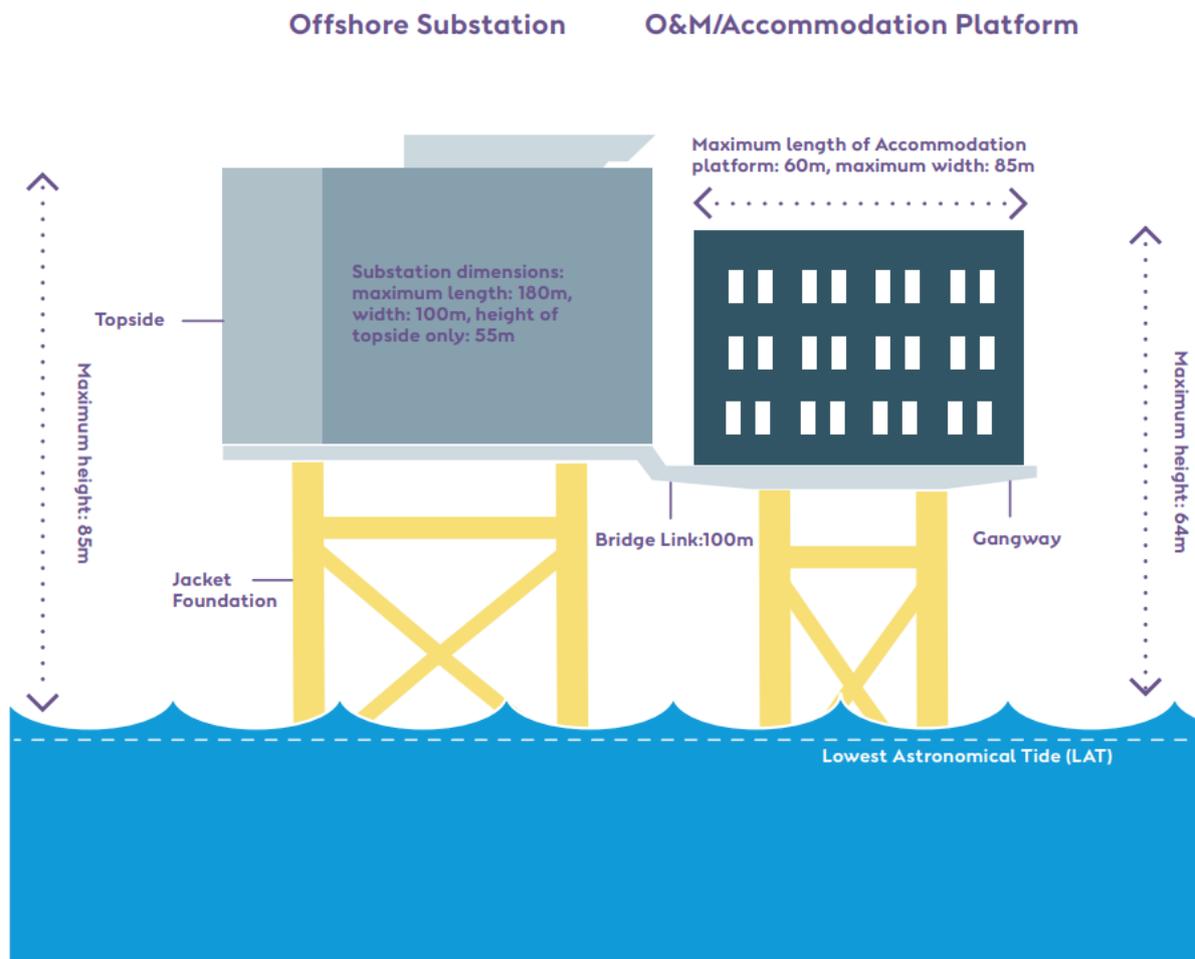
Offshore Substation and O&M/Accommodation Platform with bridge link
